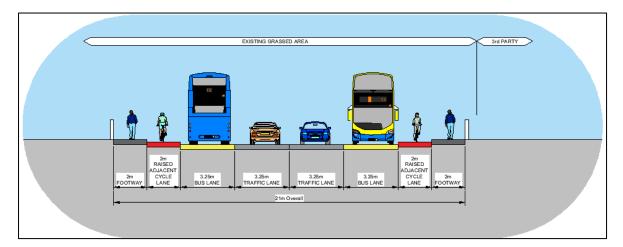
Existing EPR Routing at Parkview and Typical Cross-Section (PV2).
